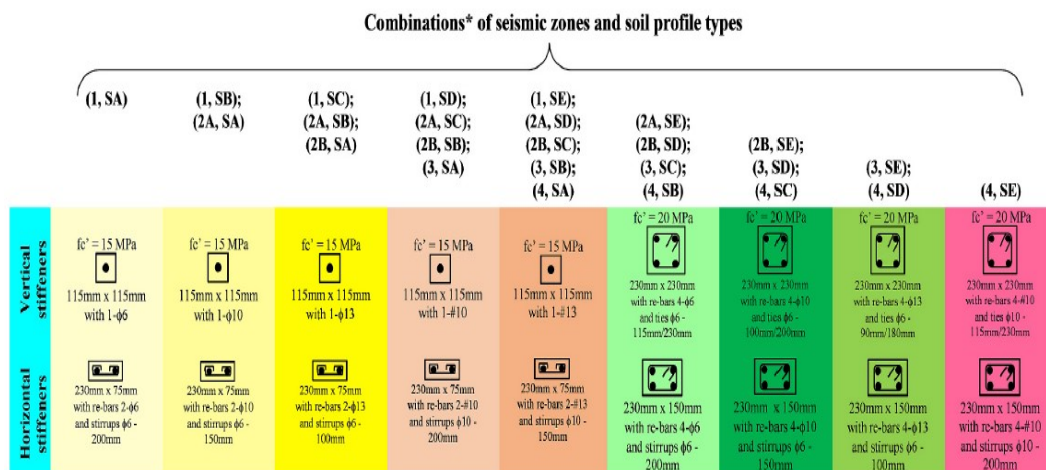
Combination of Proposed Vertical and Horizontal Reinforced Concrete Stiffeners for Different Seismic Zone and Soil Profile Types
